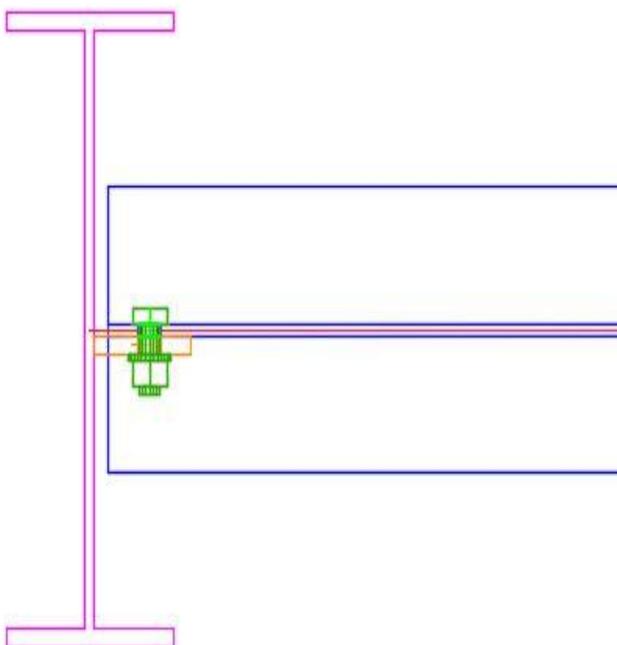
Plan view of Column & Beam shear plate connection in 2D wireframe.
